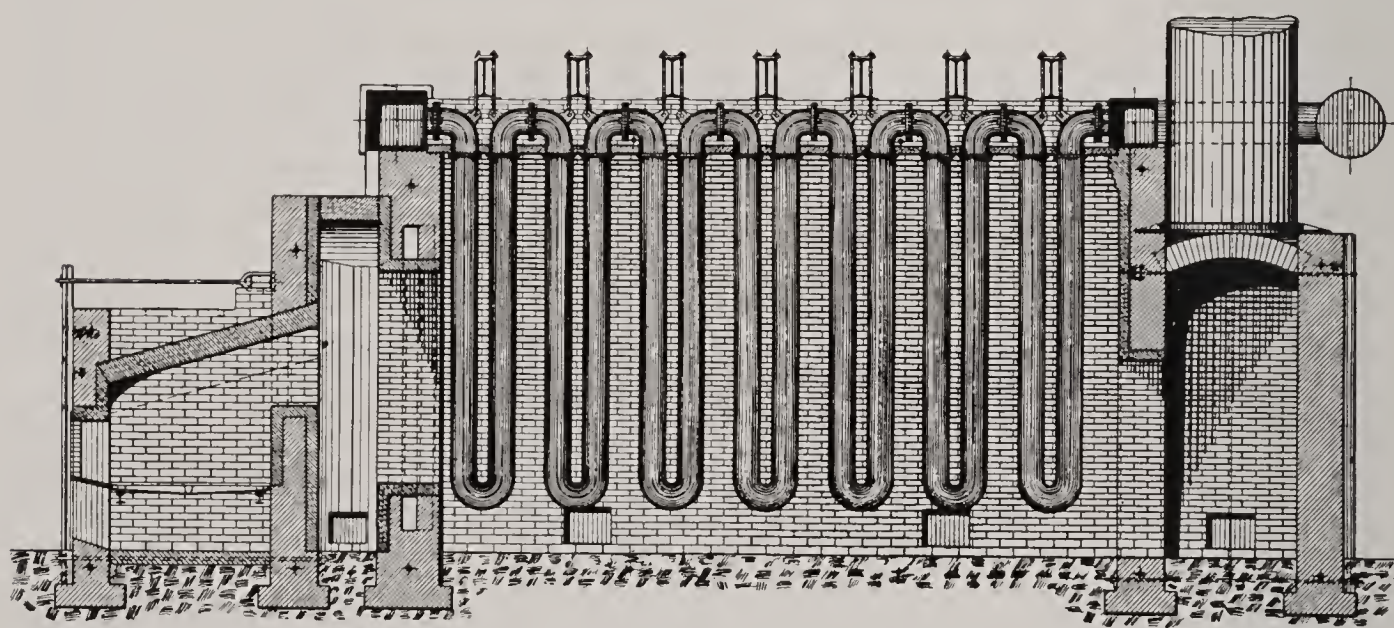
SECTIONAL ELEVATION OF U-PIPE HOT BLAST STOVE.
